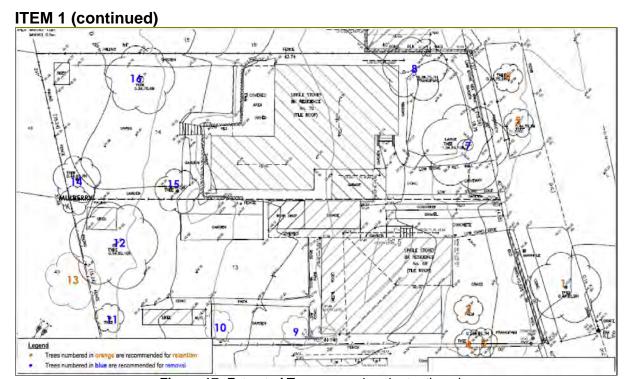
Extract of Tree removal and retention plan Source: Arboricultural Impact Assessment and Tree Management Plan submitted with application
